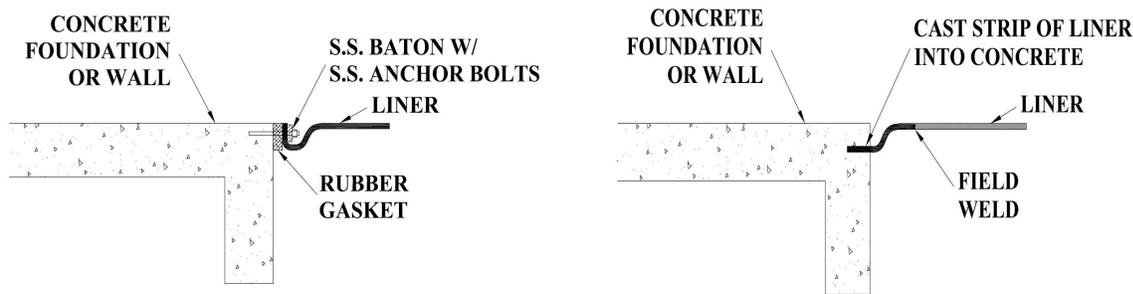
Typical HDPE Fastening to Concrete Structures Detail
